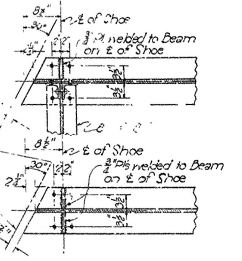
DETAIL OF CONNECTION OF ROADWAY EXP. DEVICE TO BEAMS
